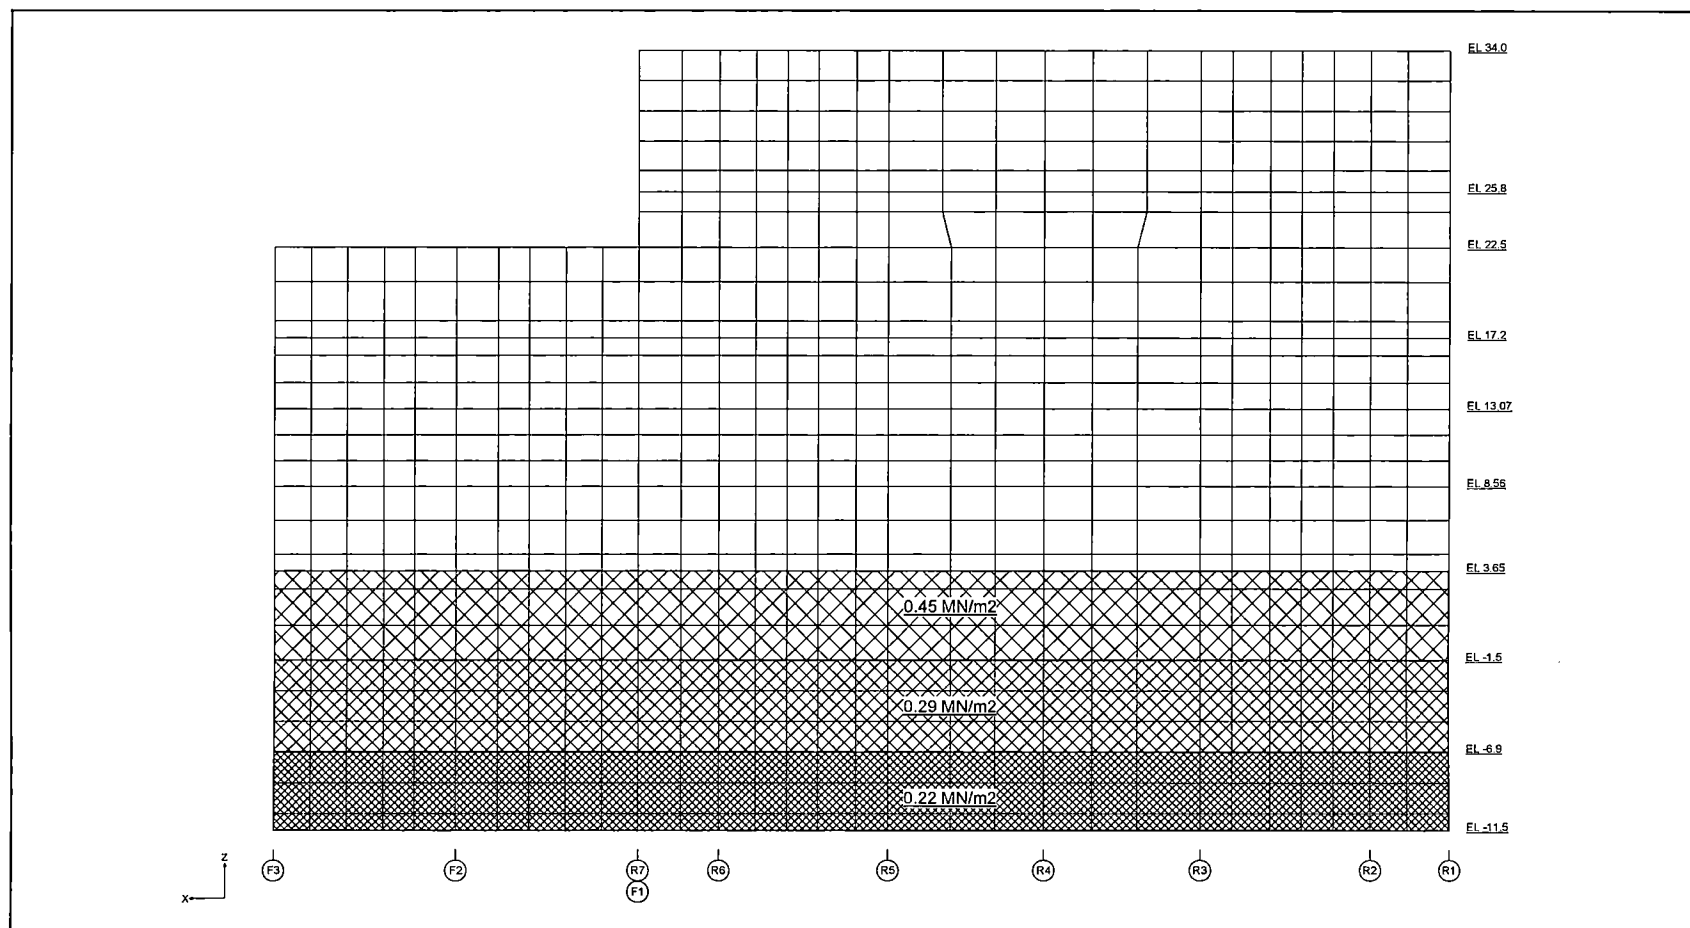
Soil Pressure Due to E-W Direction Earthquake on the External Wall (RA/FA Column Line)
